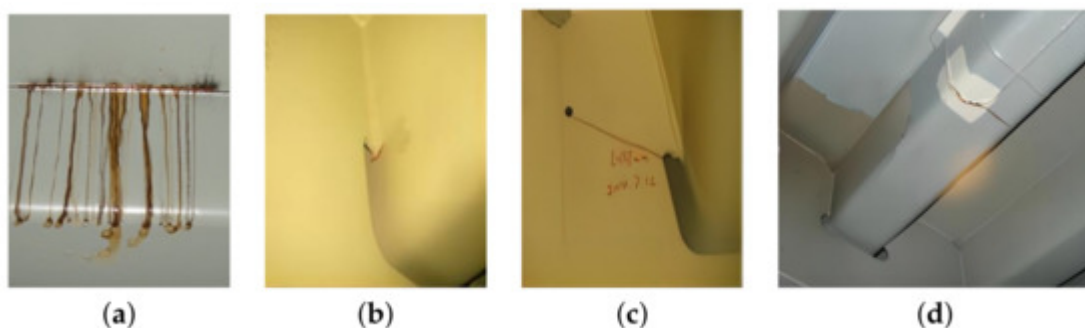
The typical locations of fatigue cracking: (a) Rib-to-deck crack; (b) Rib-to-floorbeam crack; (c) Cutout crack; (d) Rib splice crack.
